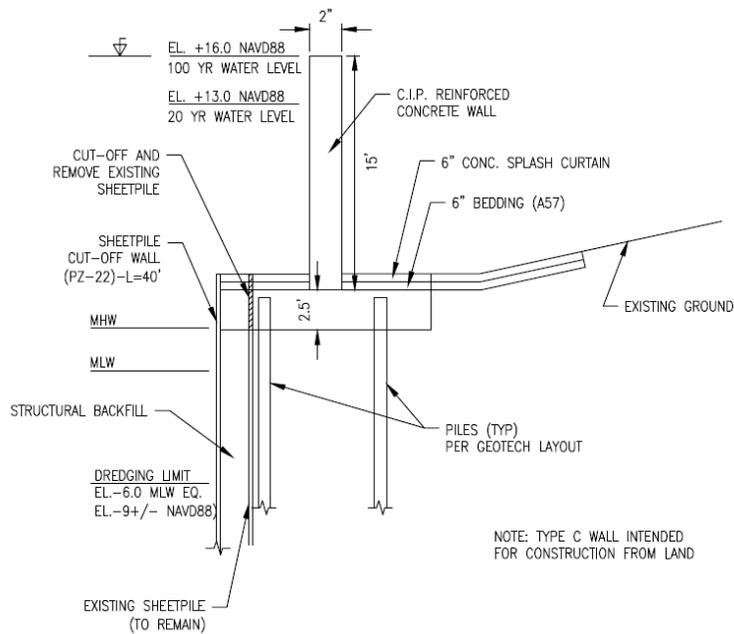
Typical Section - Concrete Cantilever Wall on Piles - Type C
